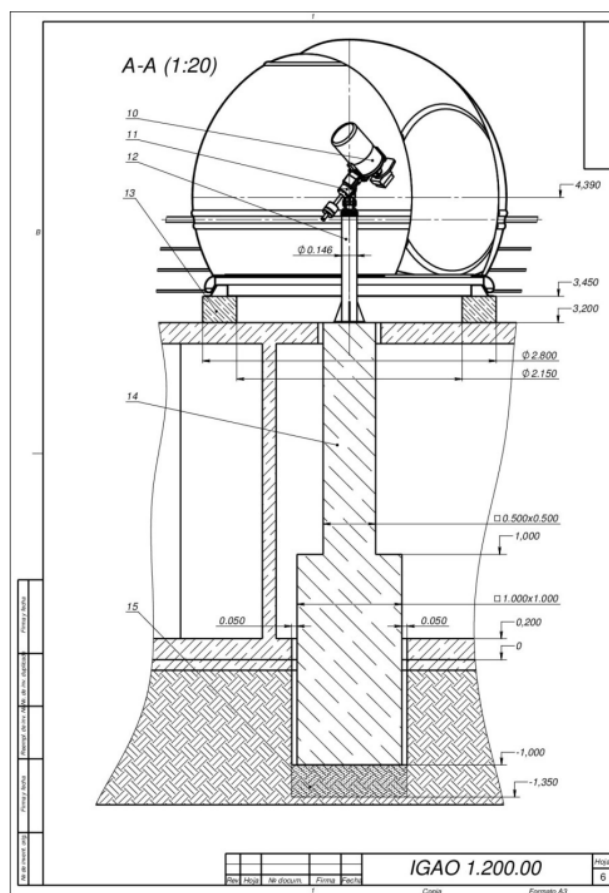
Drawing of installation of the RCO optical station layout main observational equipment: 20 cm telescope lifted using the 4.2 m concrete column and its dome on the roof of the building.
